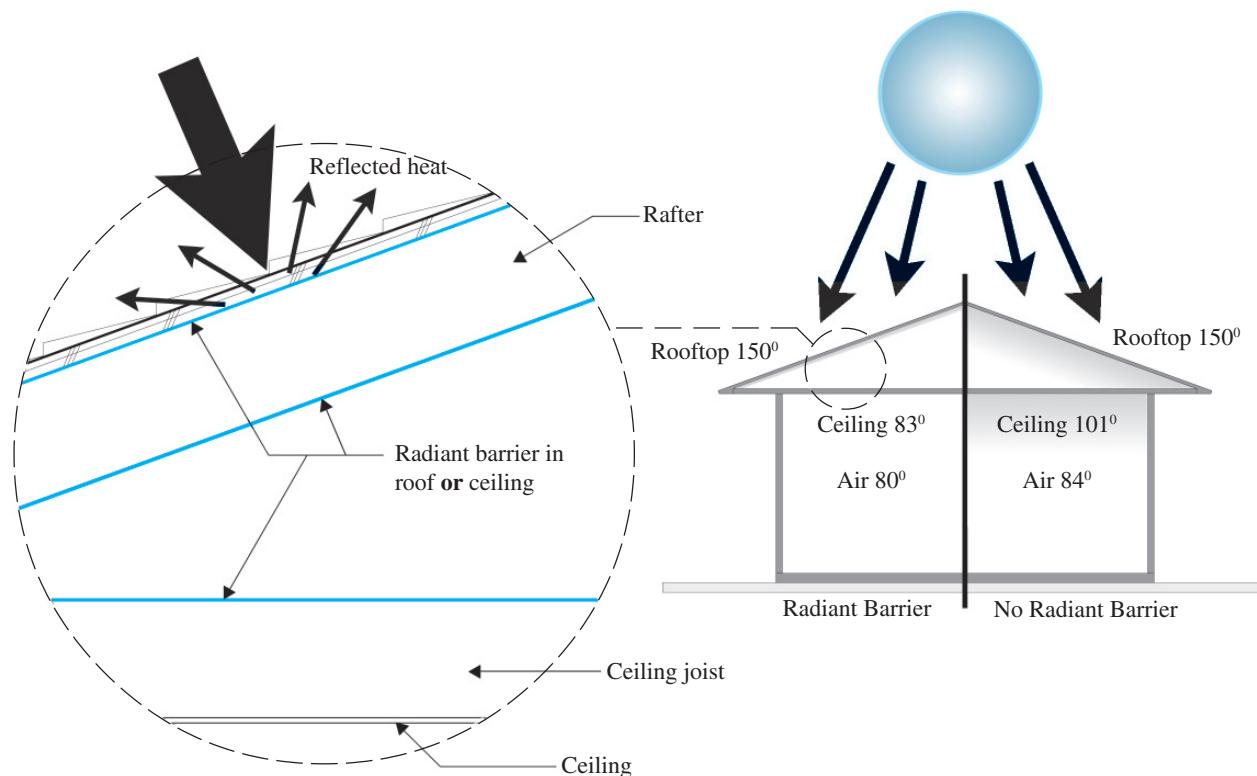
Use Radiant Barriers in Ceilings to Reduce Heat Gain.
